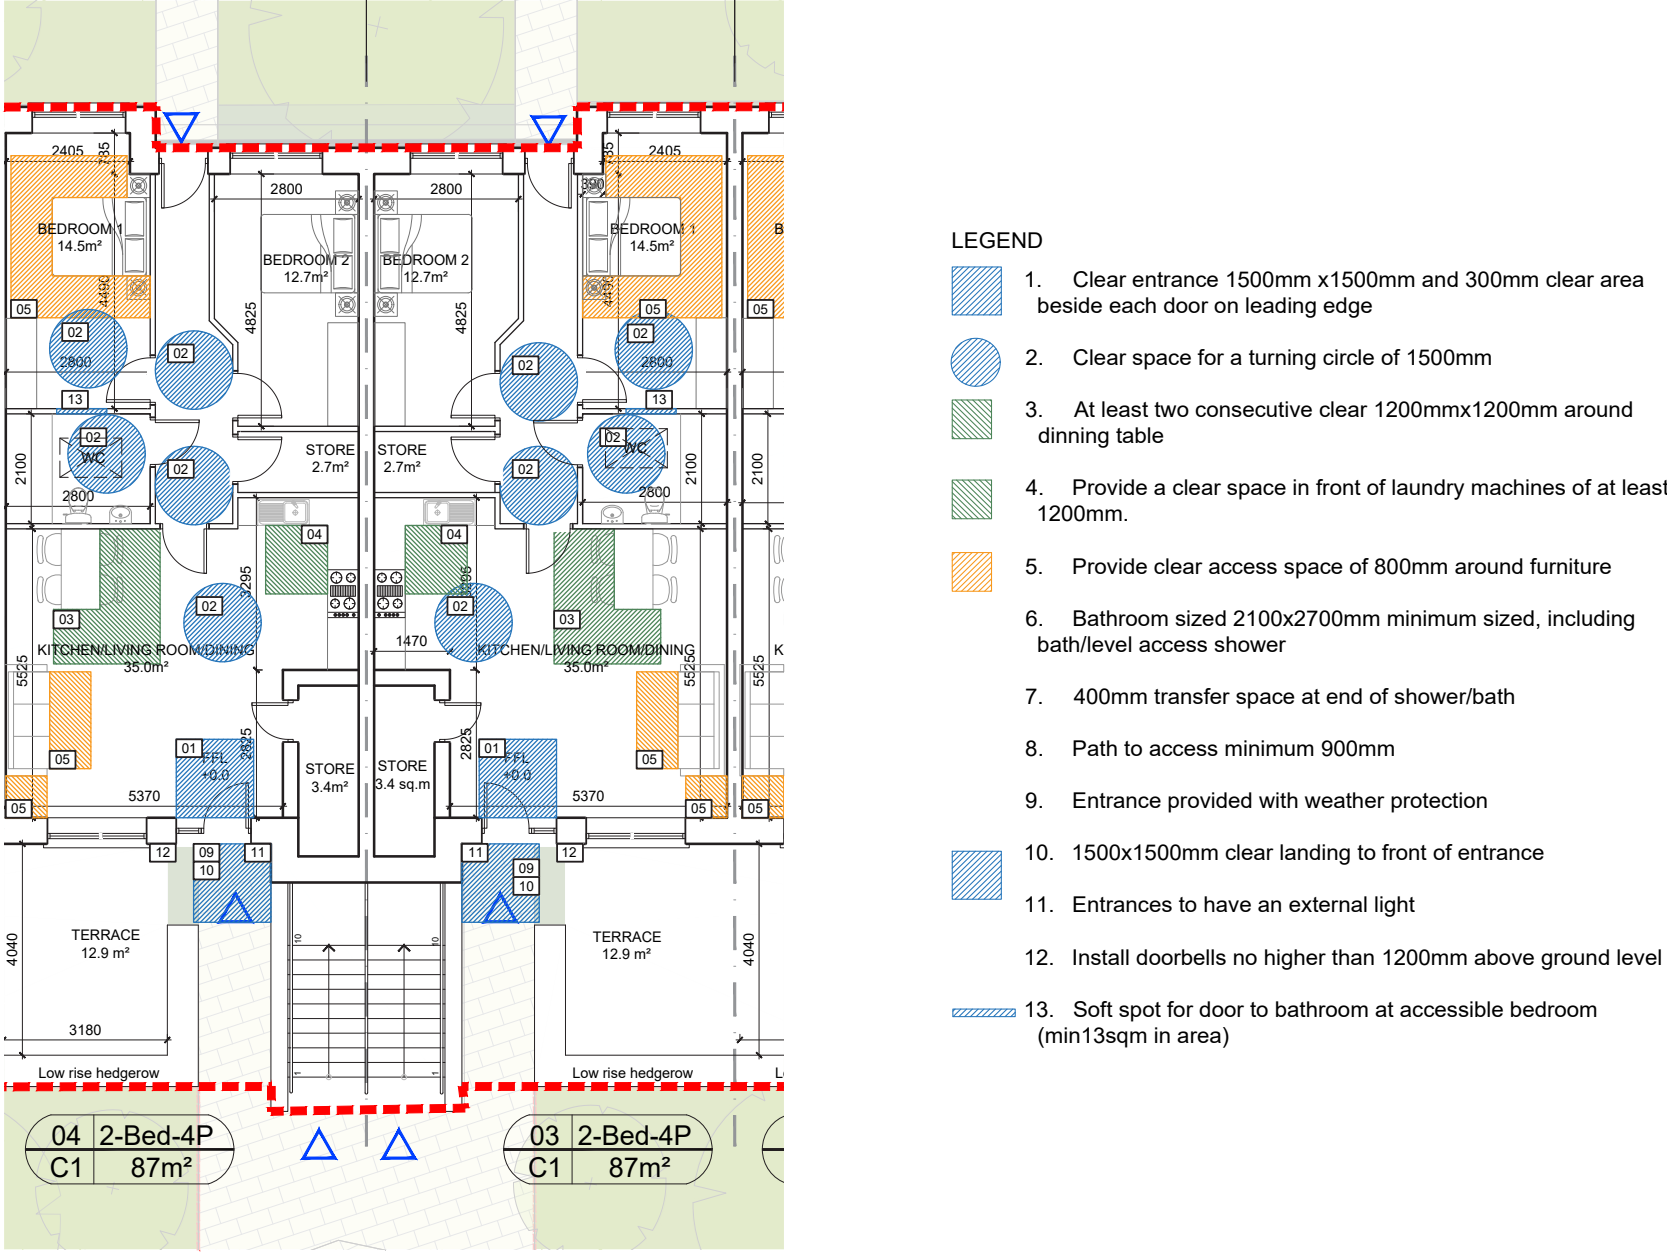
UD unit layouts - Duplex Block J . Source: MCORM, 2024
